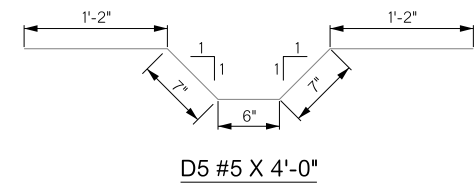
DETAIL OF DECK REPAIR AT CONSTRUCTION JOINT
